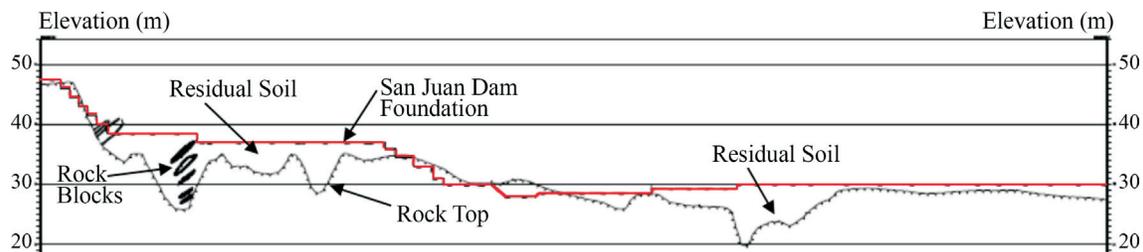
San Juan Dam Axis Section (upstream) presenting the foundation elevations and the estimated bedrock surface. Original scale 1:250.
